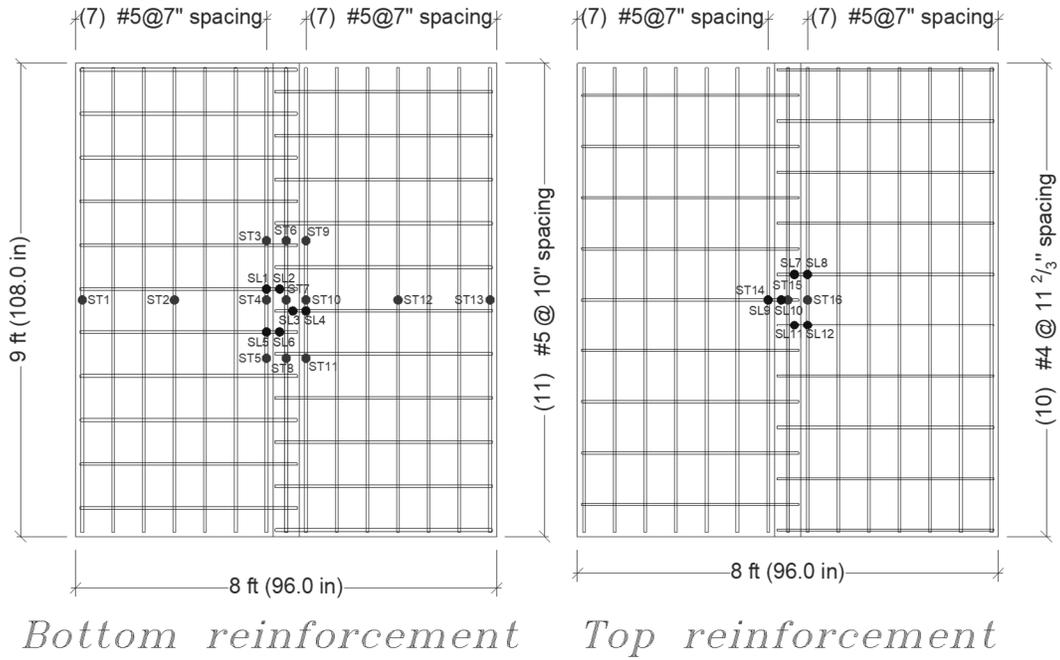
Structural details and instrumentation plan for the first transverse specimen (SP-1).
